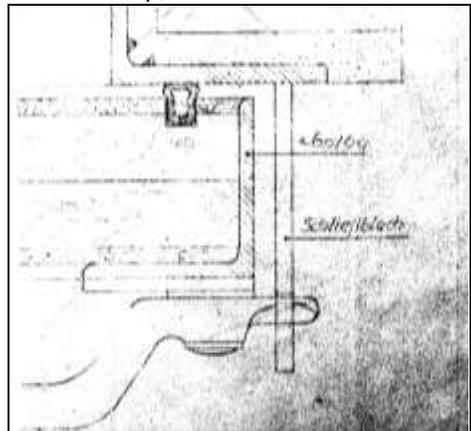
One of the eight wedge locks of a gas-tight steel door, type “air-raid shelter”, offered to the Auschwitz Camp, but never delivered. The wedging of these levers into the lock position could rightly be called “screwed shut”.
